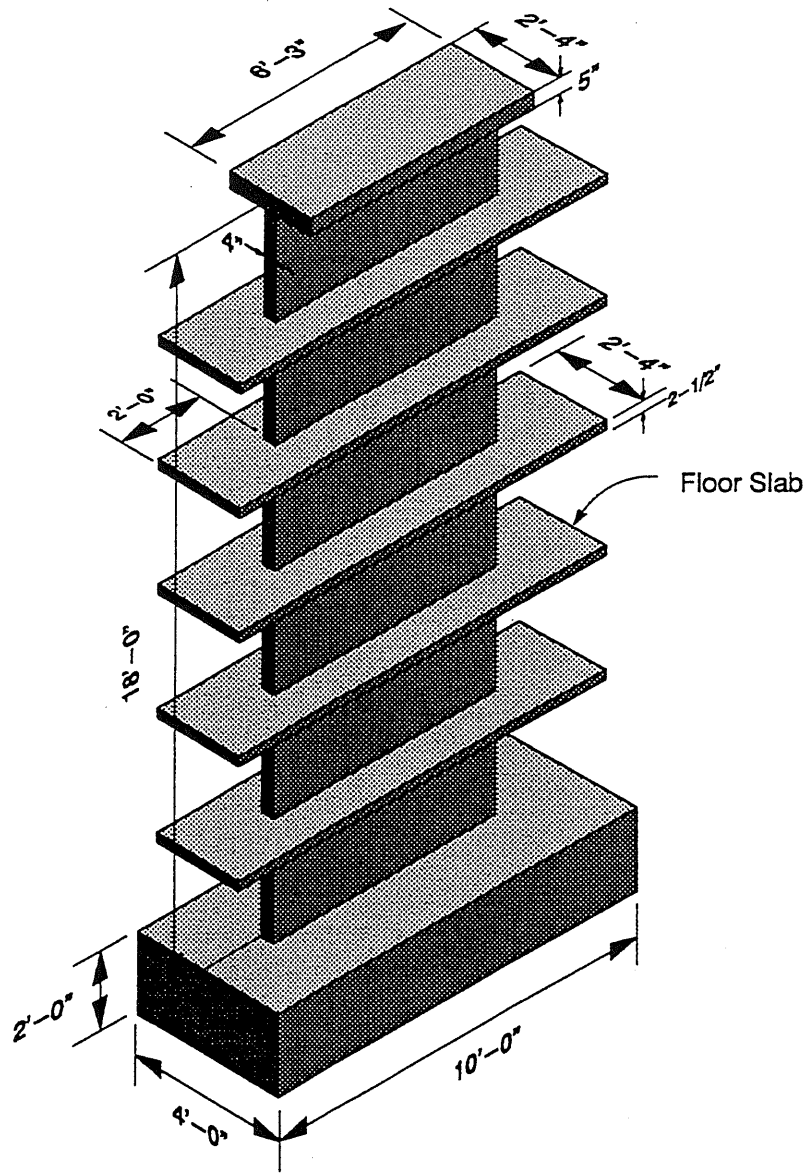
Overall Dimensions of Walls CI1 and PW1
